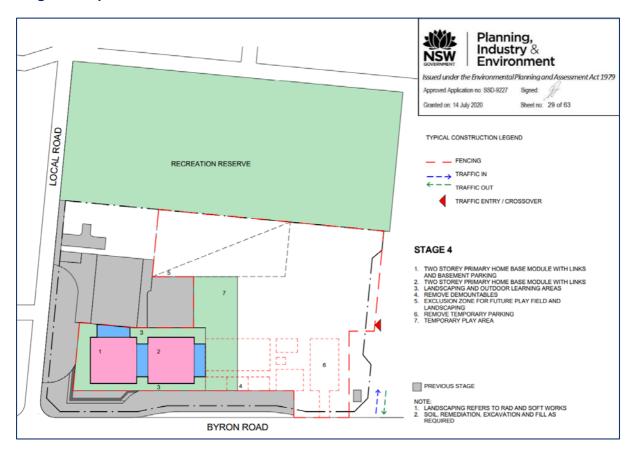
| Stage 4 site plan – as approved (Source: SSD-9227 Approved Plans)
